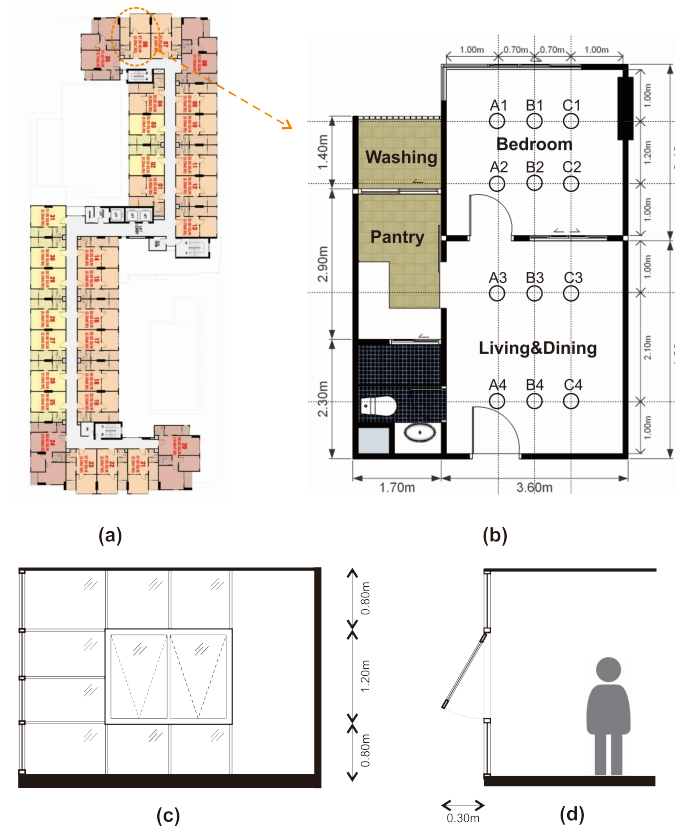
Building's floor layout and a room with grids for indoor air velocity measurement: (a) Building's typical floor layout; (b) Unit floor layout; (c) Room's external façade with top-hung windows; and (d) Detail of the room's main window.
